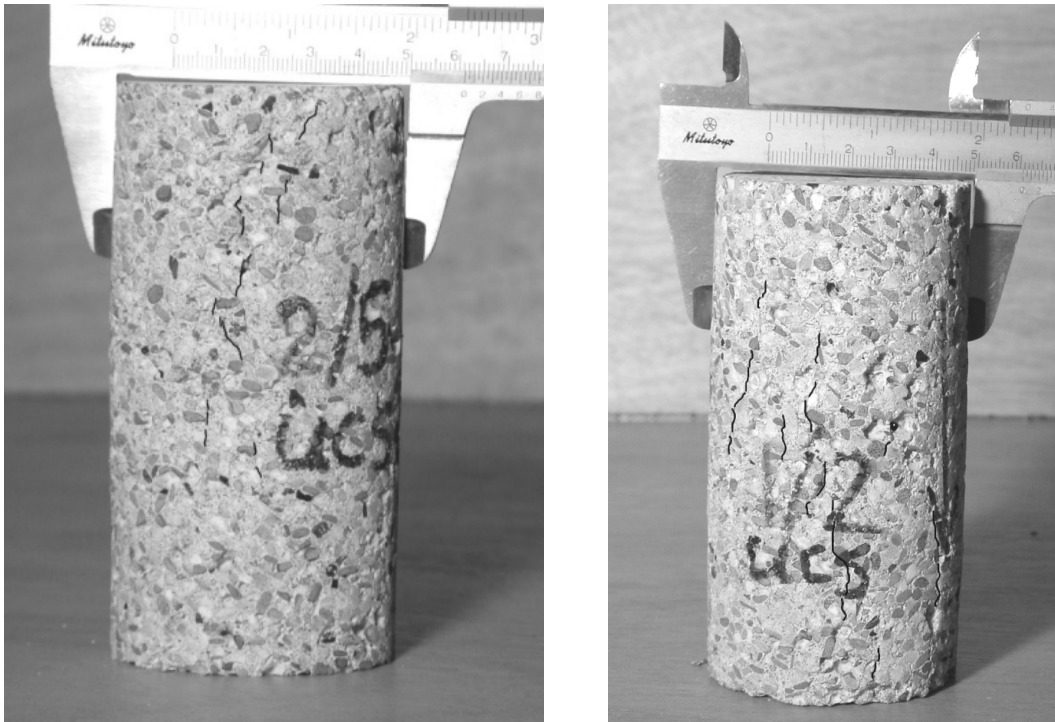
Example of fractures observed in M4 after uniaxial compressive tests. Fractures that were visible to naked eye are highlighted in black.
